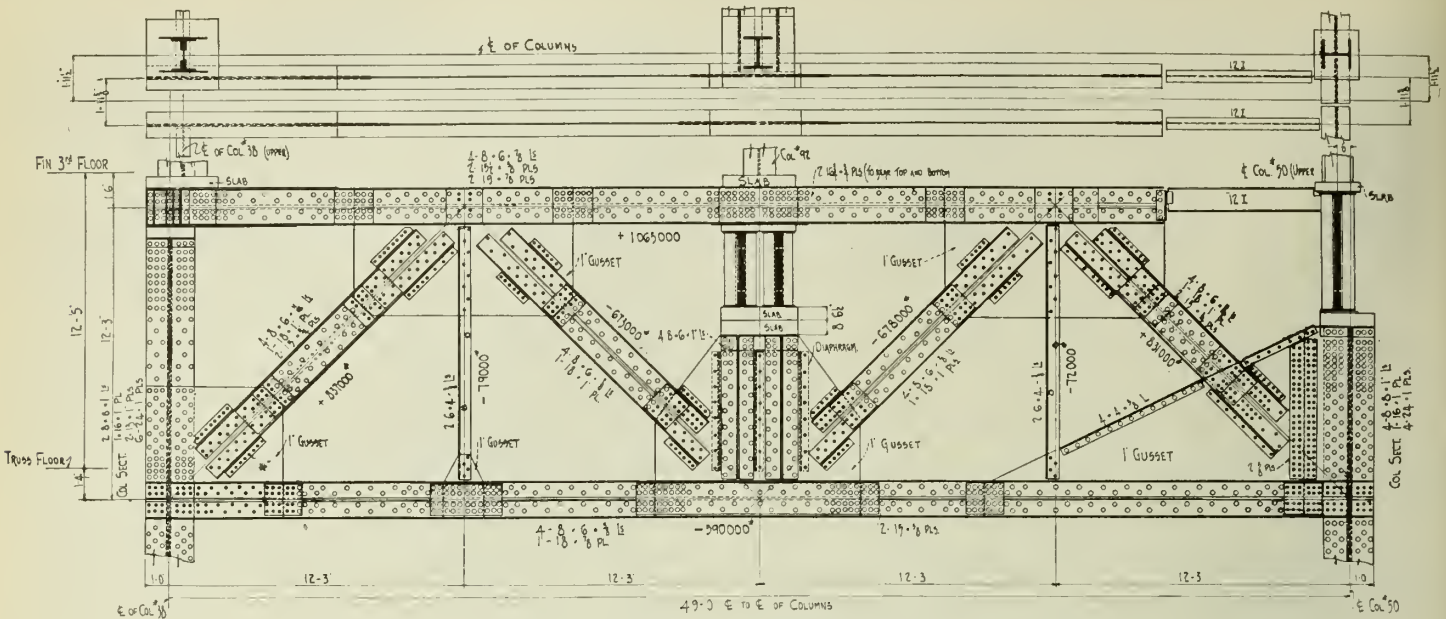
Details of Truss between Columns Thirty-eight and Fifty.
